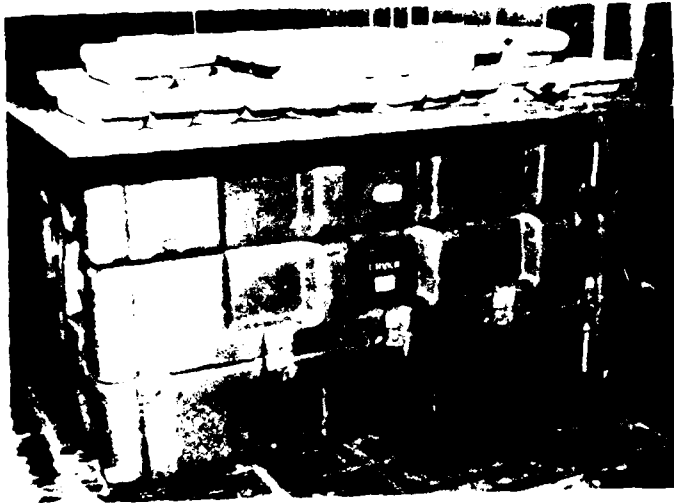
A view of lead weight equally distributed on the container for the superimposed-load test.
